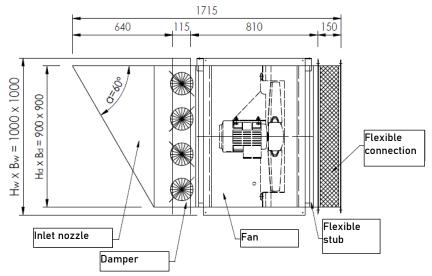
Basic dimensions of the standard mcr EXi-F 80-1S, 71-1S, 71-2S air supply units in a box-type housing - horizontal installation.
